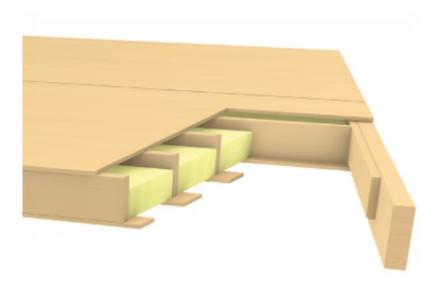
Section of a connection between the outer walls and the floor slab, based on a floor slab solution from Moelven.
